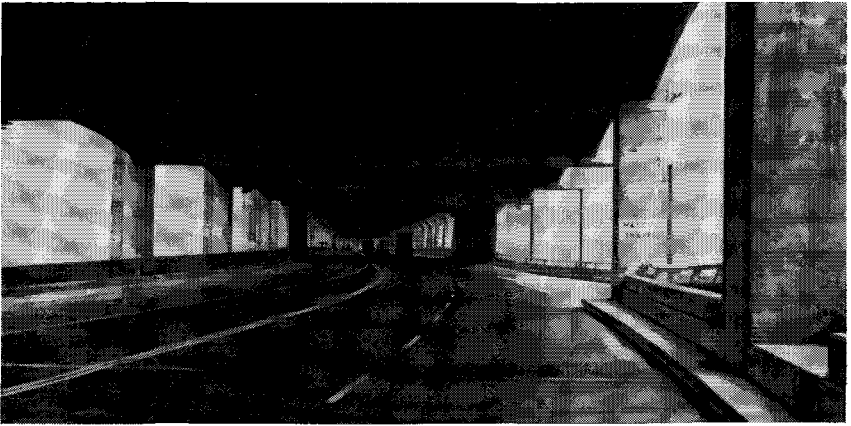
Looking East from Bent 51 After Column Removal by Prestressing.
